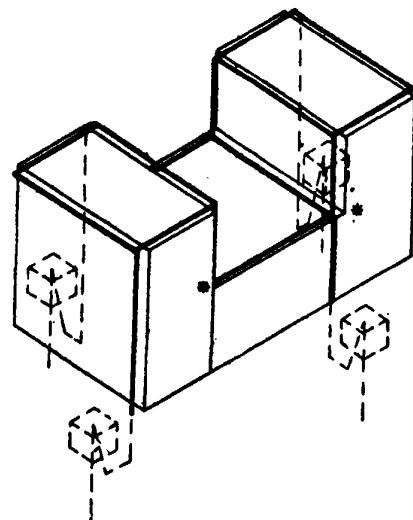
AIR TERMINATIONS FOR A FLAT ROOF
